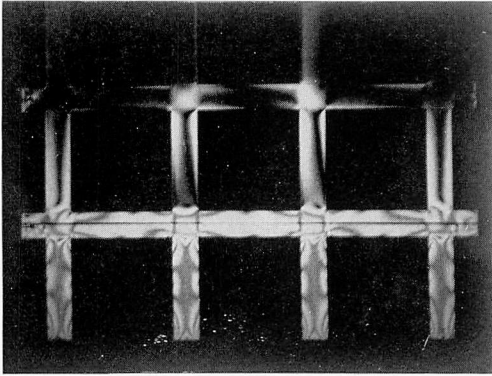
d Isochromatics of Frame without Wall Panel Subjected to Lateral Forces on second Floor Beams
